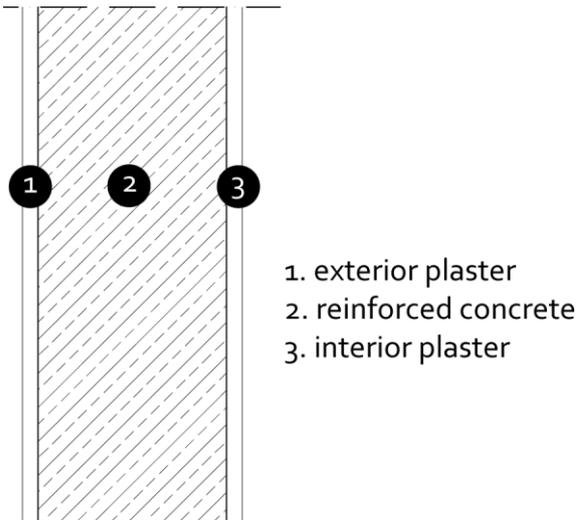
Common practice load bearing structure – Buildings like MF1, MF2, MF3 (161)
